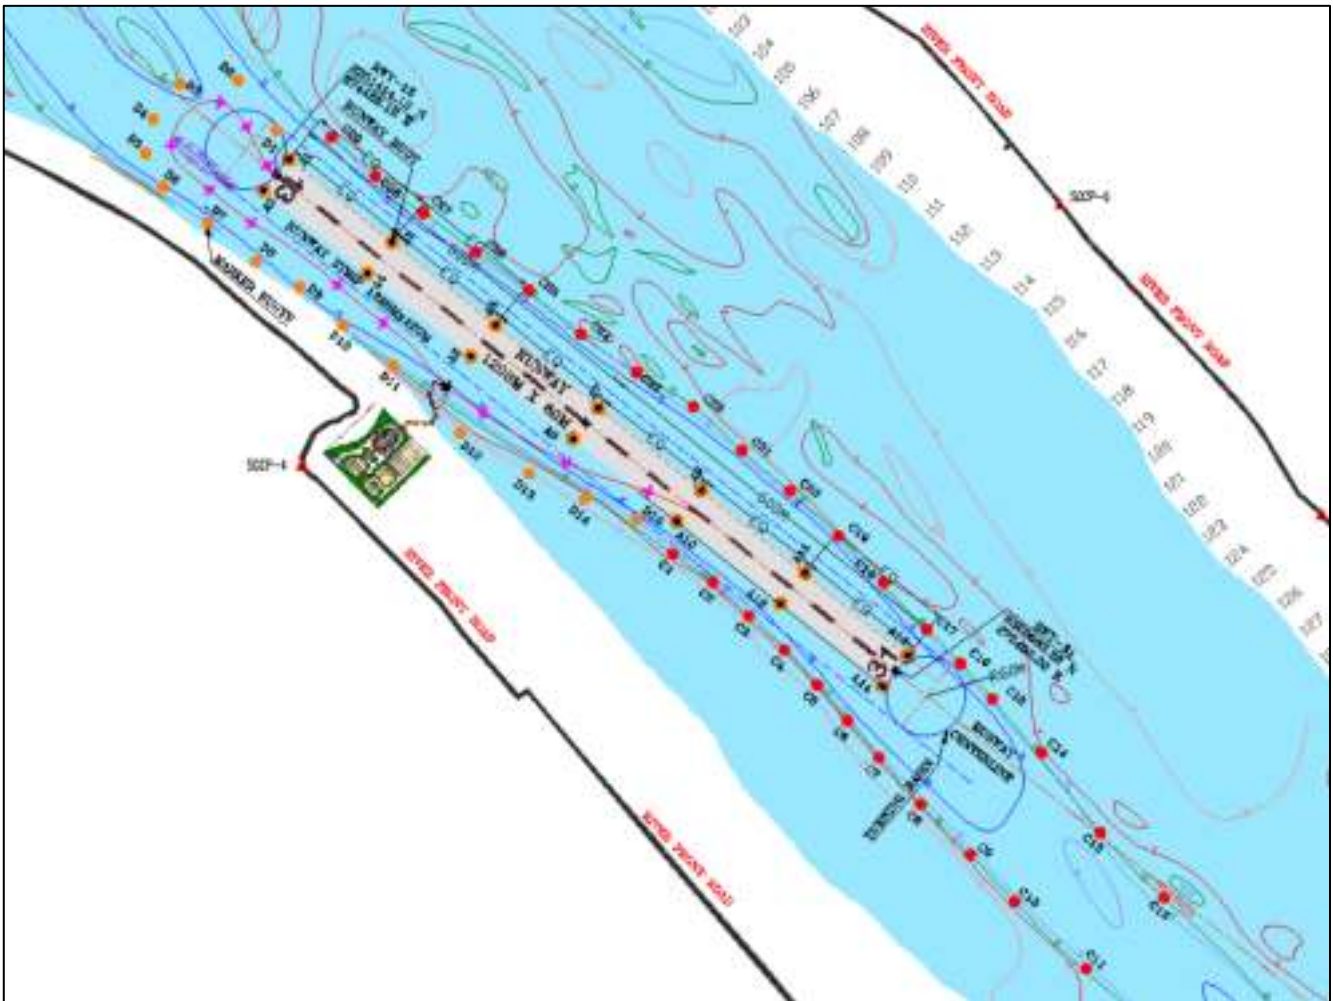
LAYOUT OF WATER RUNWAY STRIP
